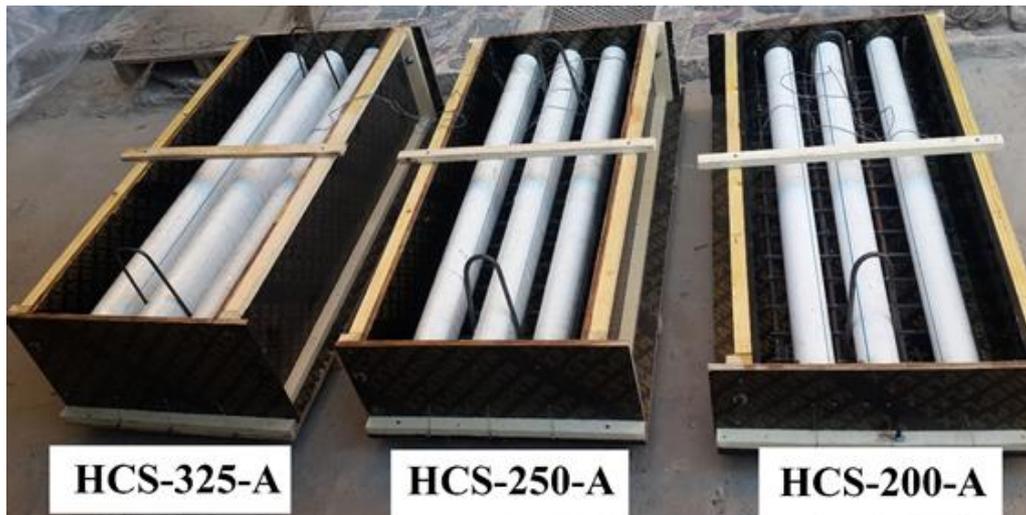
Install pipe and steel reinforcement in the molds for HCS Specimens without Shear Reinforcement
